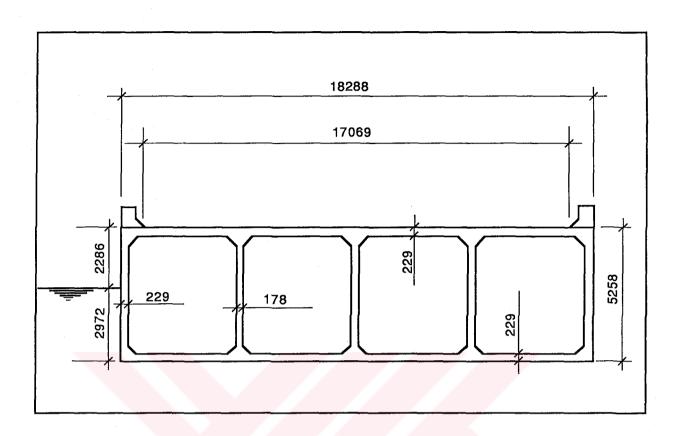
TYPICAL CROSS SECTION (in mm)
